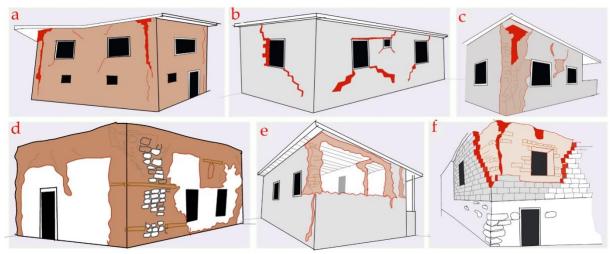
Schematic representation of load-bearing wall damages in masonry structures a) separation at corners b) window corners damages c) out-of-plane wall corner damages d) Falling of exterior materials e) out-of-plane movement f) inadequate connections
